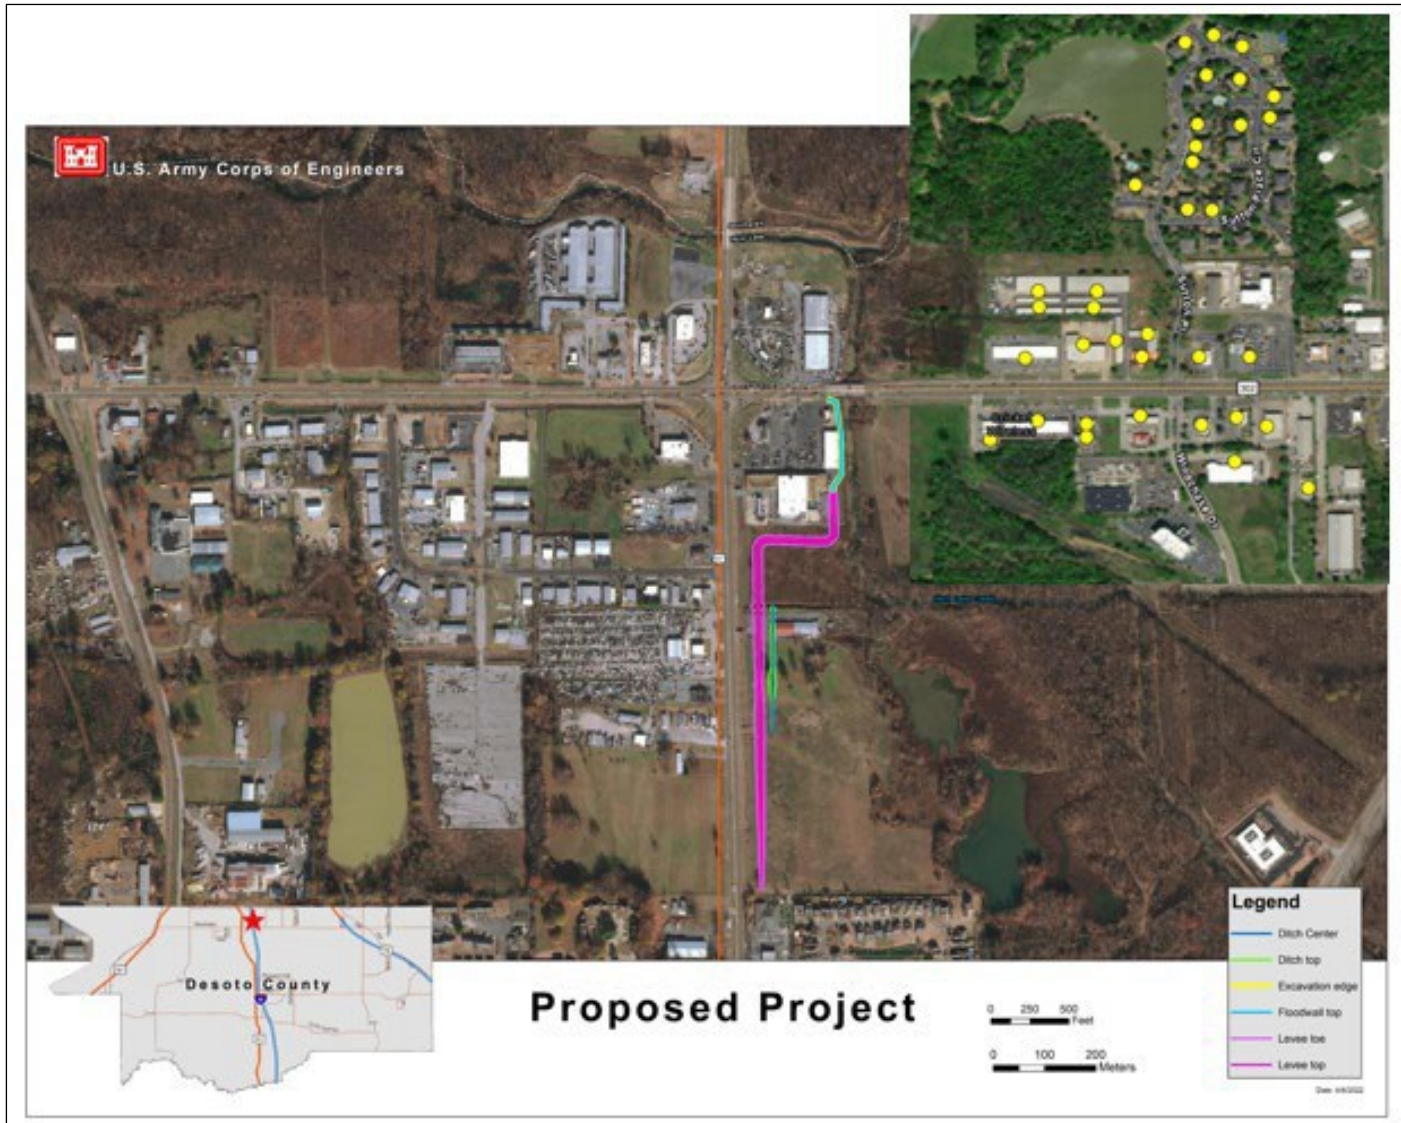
Plan 8b Levee and Floodwall, and Structures Identified for Voluntary Dry Floodproofing (yellow dots)
